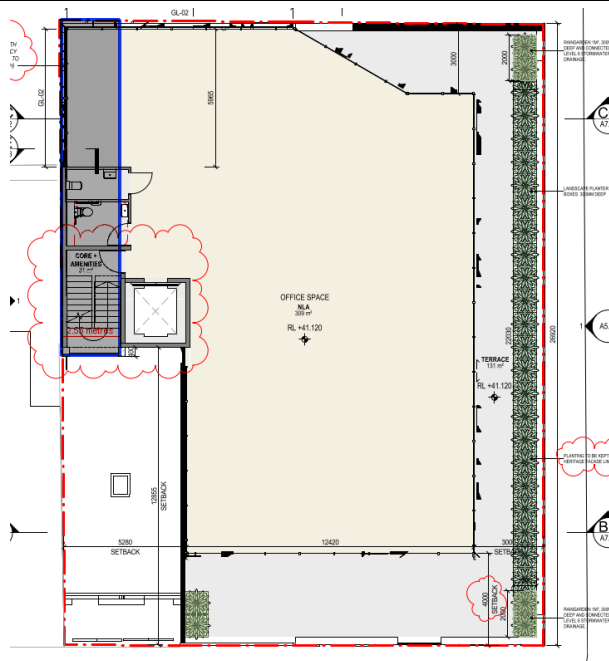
Floor Plan with recommended setback area shown with blue outline (to be continued above)
